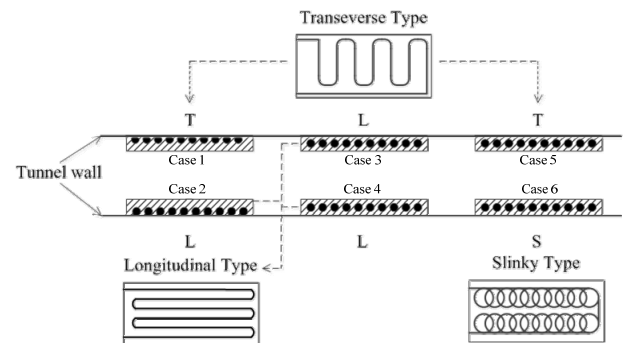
Layout of Energy Textile Constructed in Test Bed Tunnel (T: Transverse Type, L: Longitudinal Type, S: Slinky Type)
